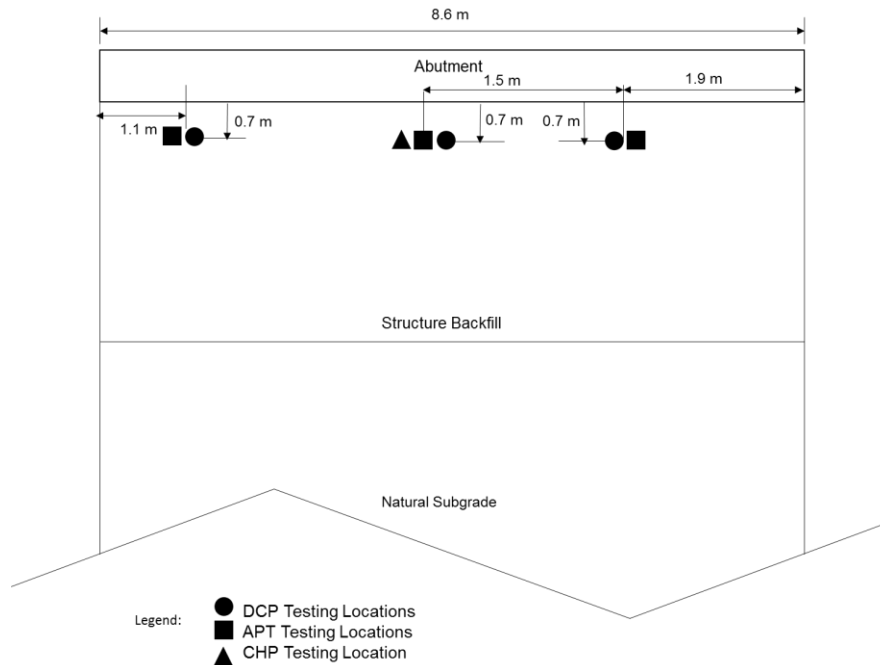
Plan view of the bridge abutment showing APT and DCP test locations at Badger Road Bridge
